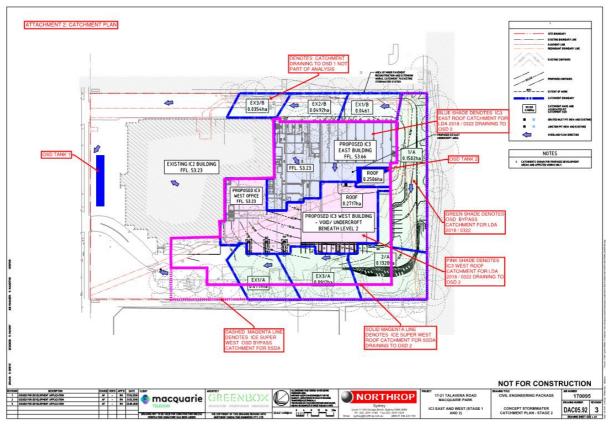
Concept Stormwater Catchment Plan (Source: Northrop, 2022)
